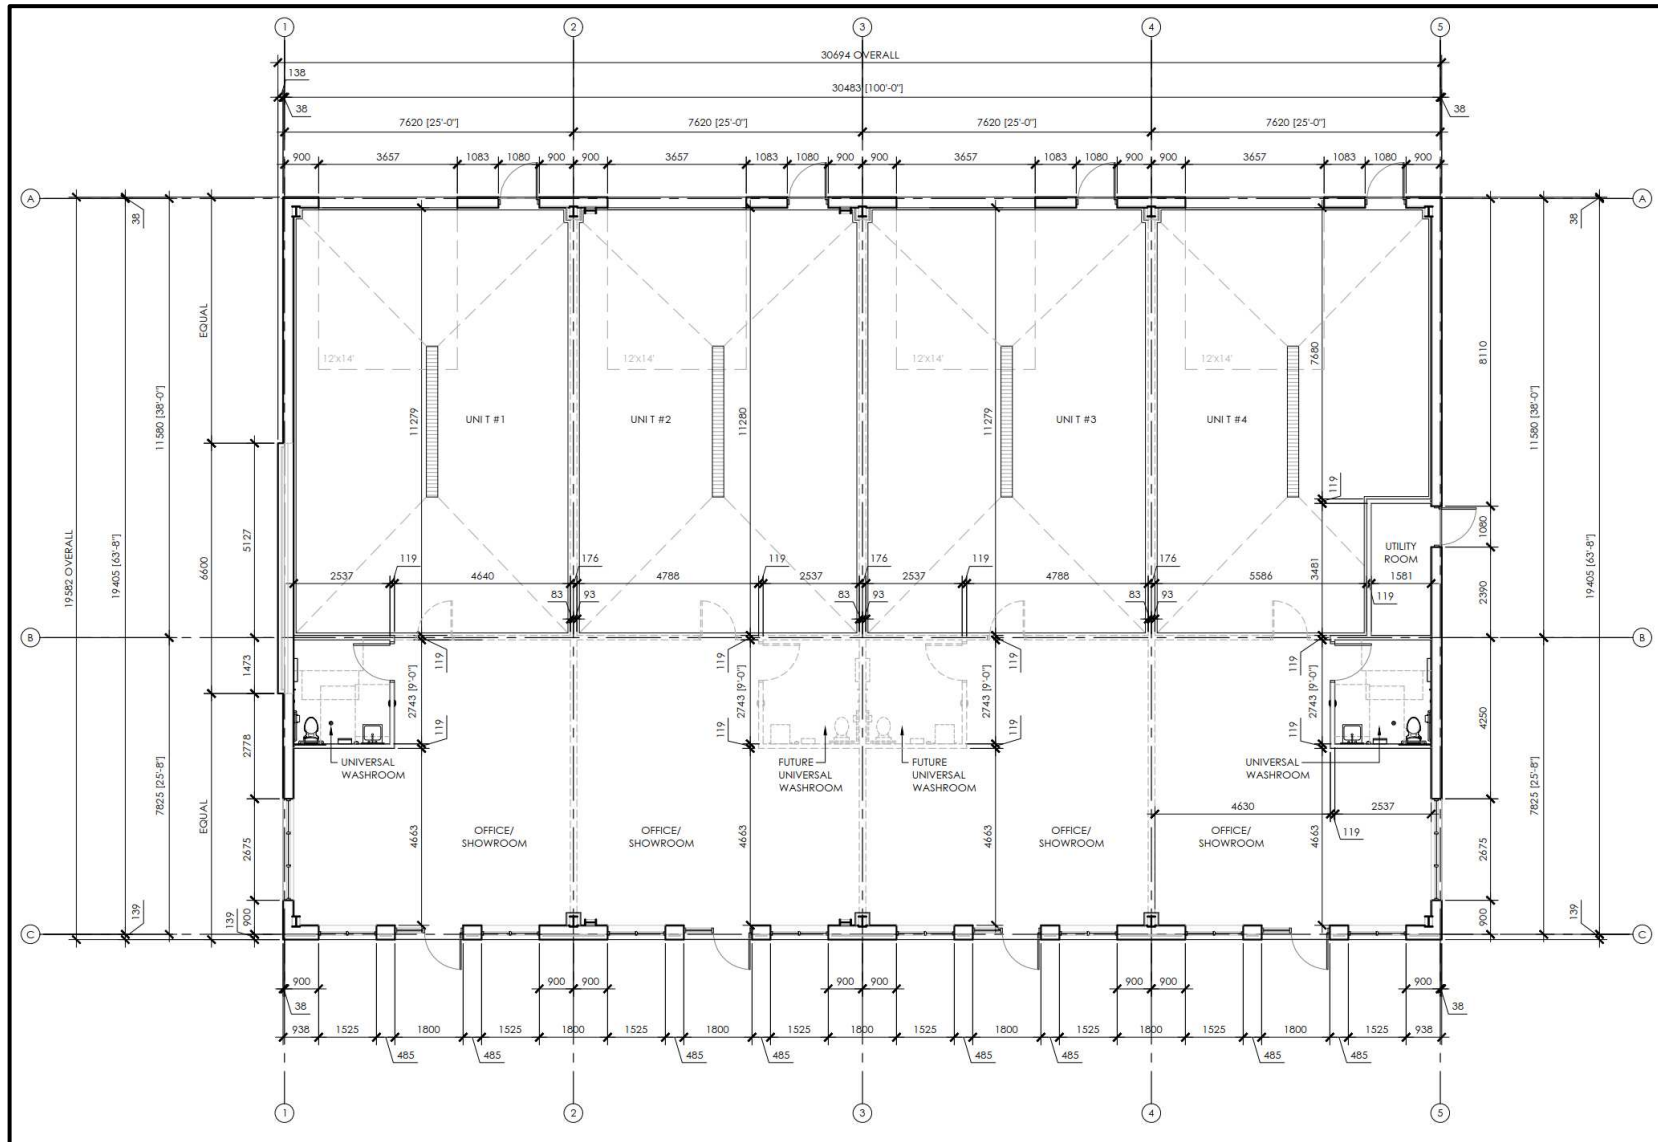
illustrates the proposed site plan, floor plan, and elevations.
